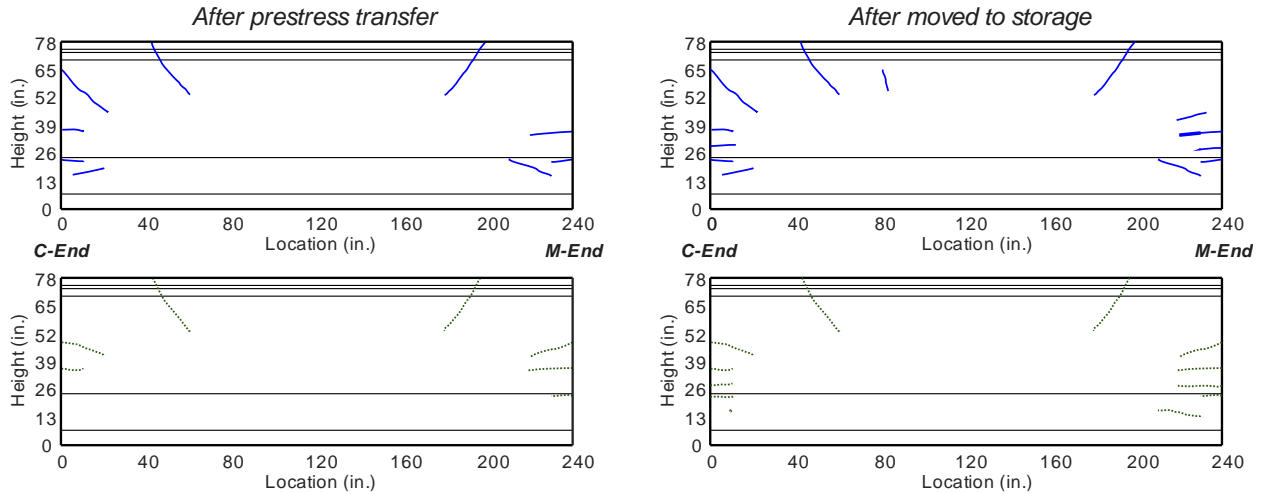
CT before and after transporting to storage crack patterns shown on North face of specimen. Solid blue lines depict cracks visible on the North face and dashed green lines depict cracks visible on the South face.
